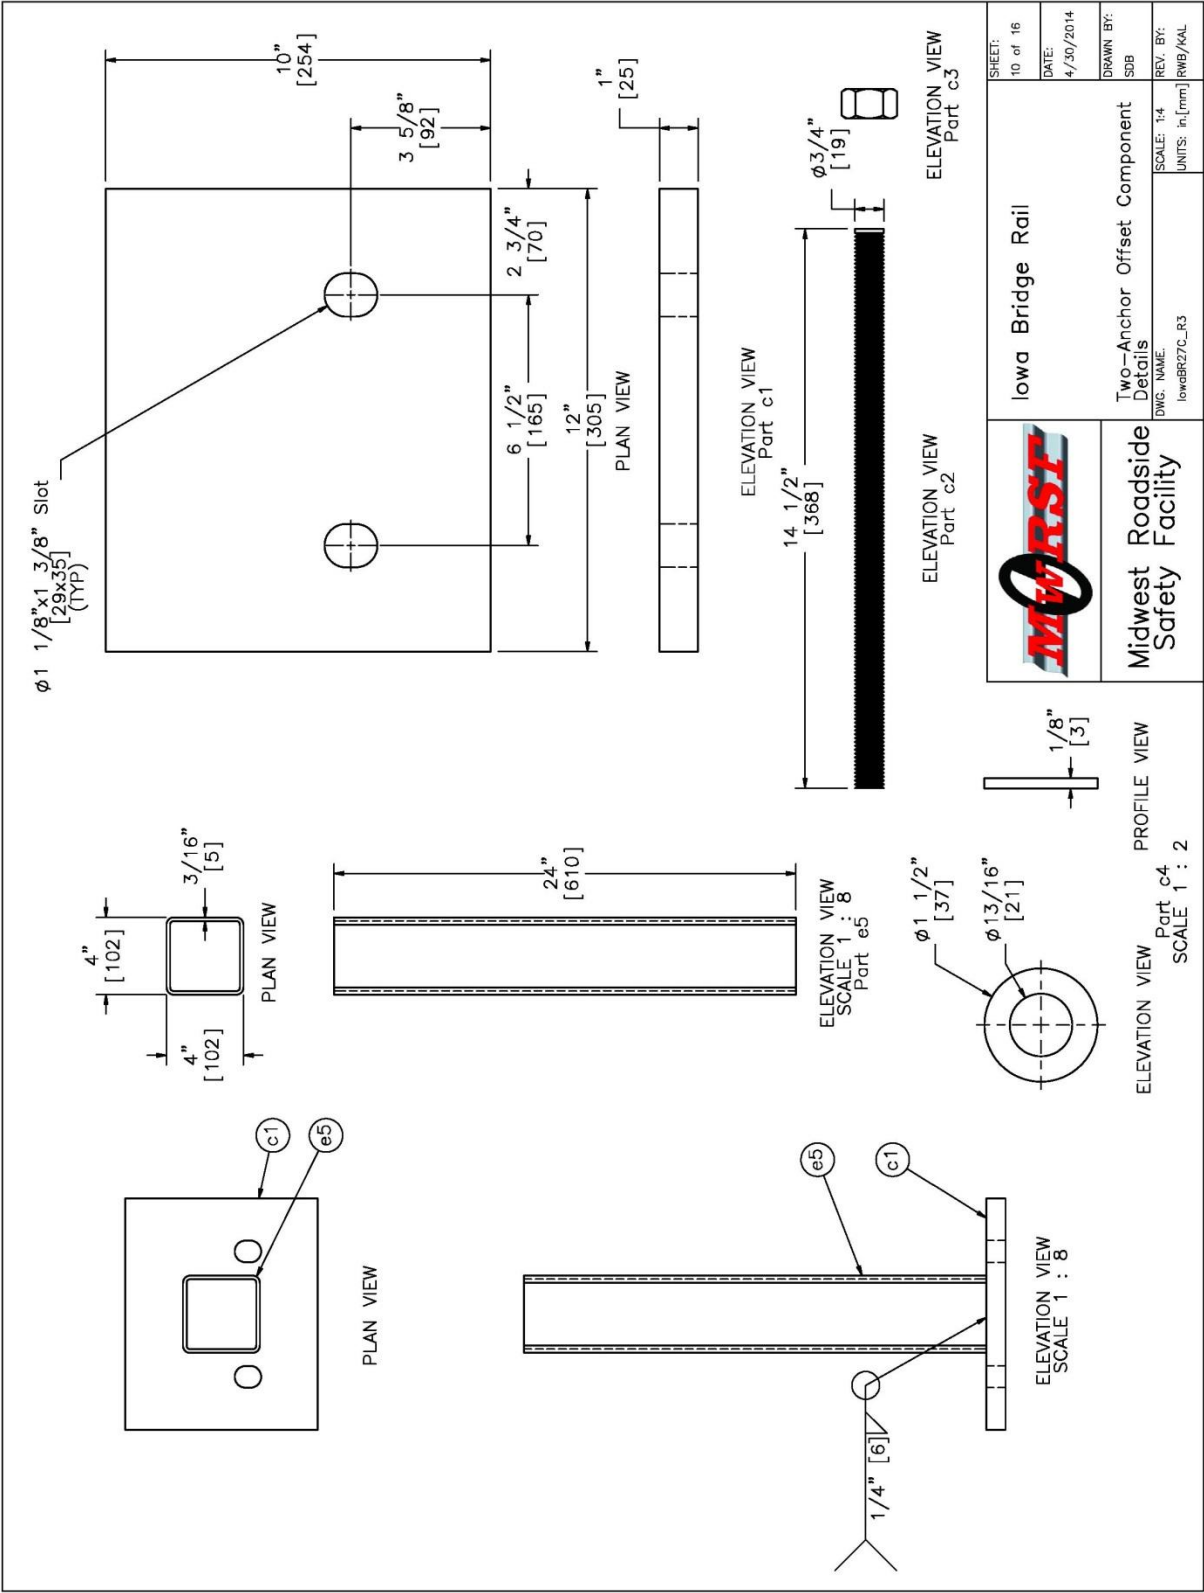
Two-Anchor Offset Component Details, Test No. IBP-3
